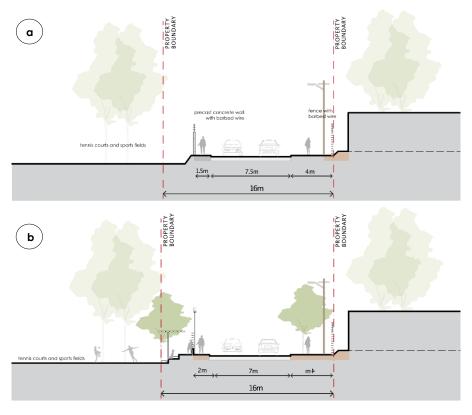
Loop Straat section before (a) and after (b) the proposed urban design upgrade along the section adjacent to Rhino Park
